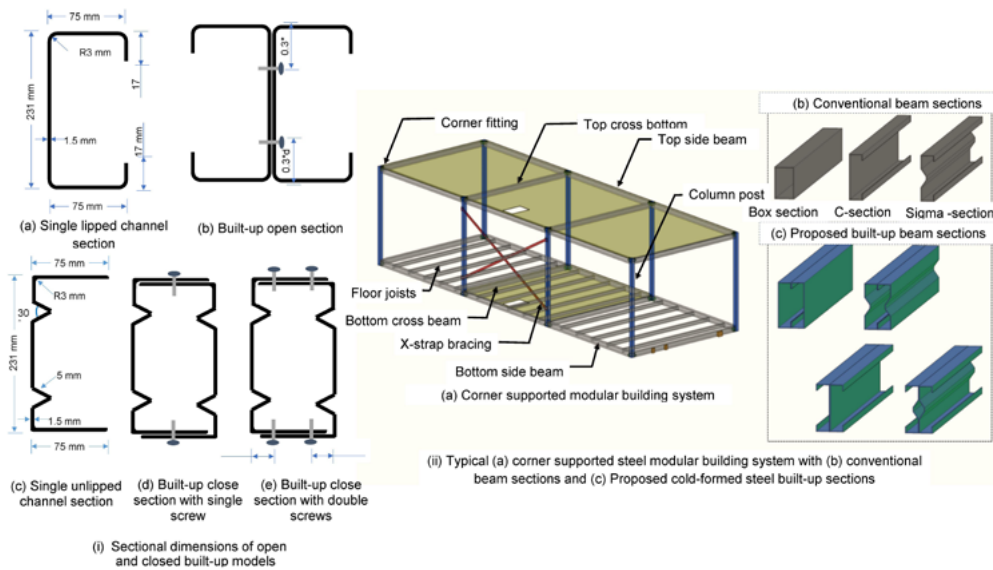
Parametric sections and a corner-supported modular building system with conventional beam profiles and proposed innovative built-up section
